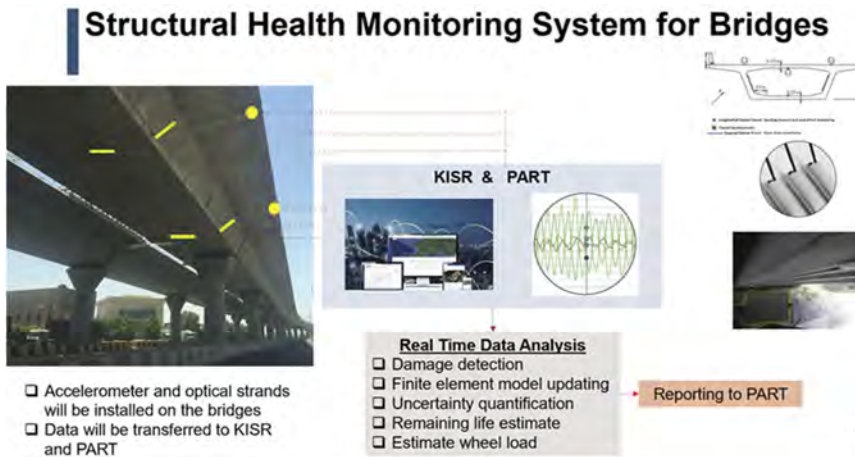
SHM system implemented in a concrete Highway bridge in Kuwait.
